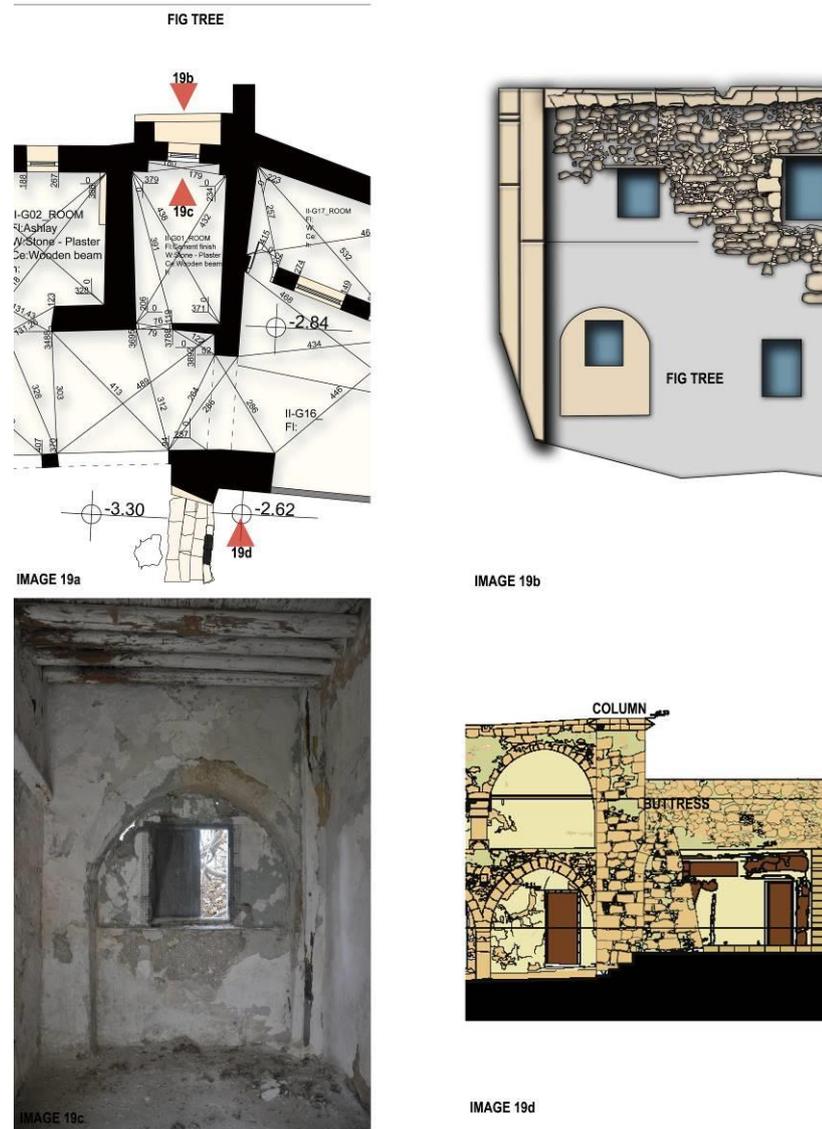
(a) Plan of the room II-G 01 (b) Survey Drawing of the North Façade of the room (c) Image of the room's north wall (d) Survey Drawing of the Column Footing
